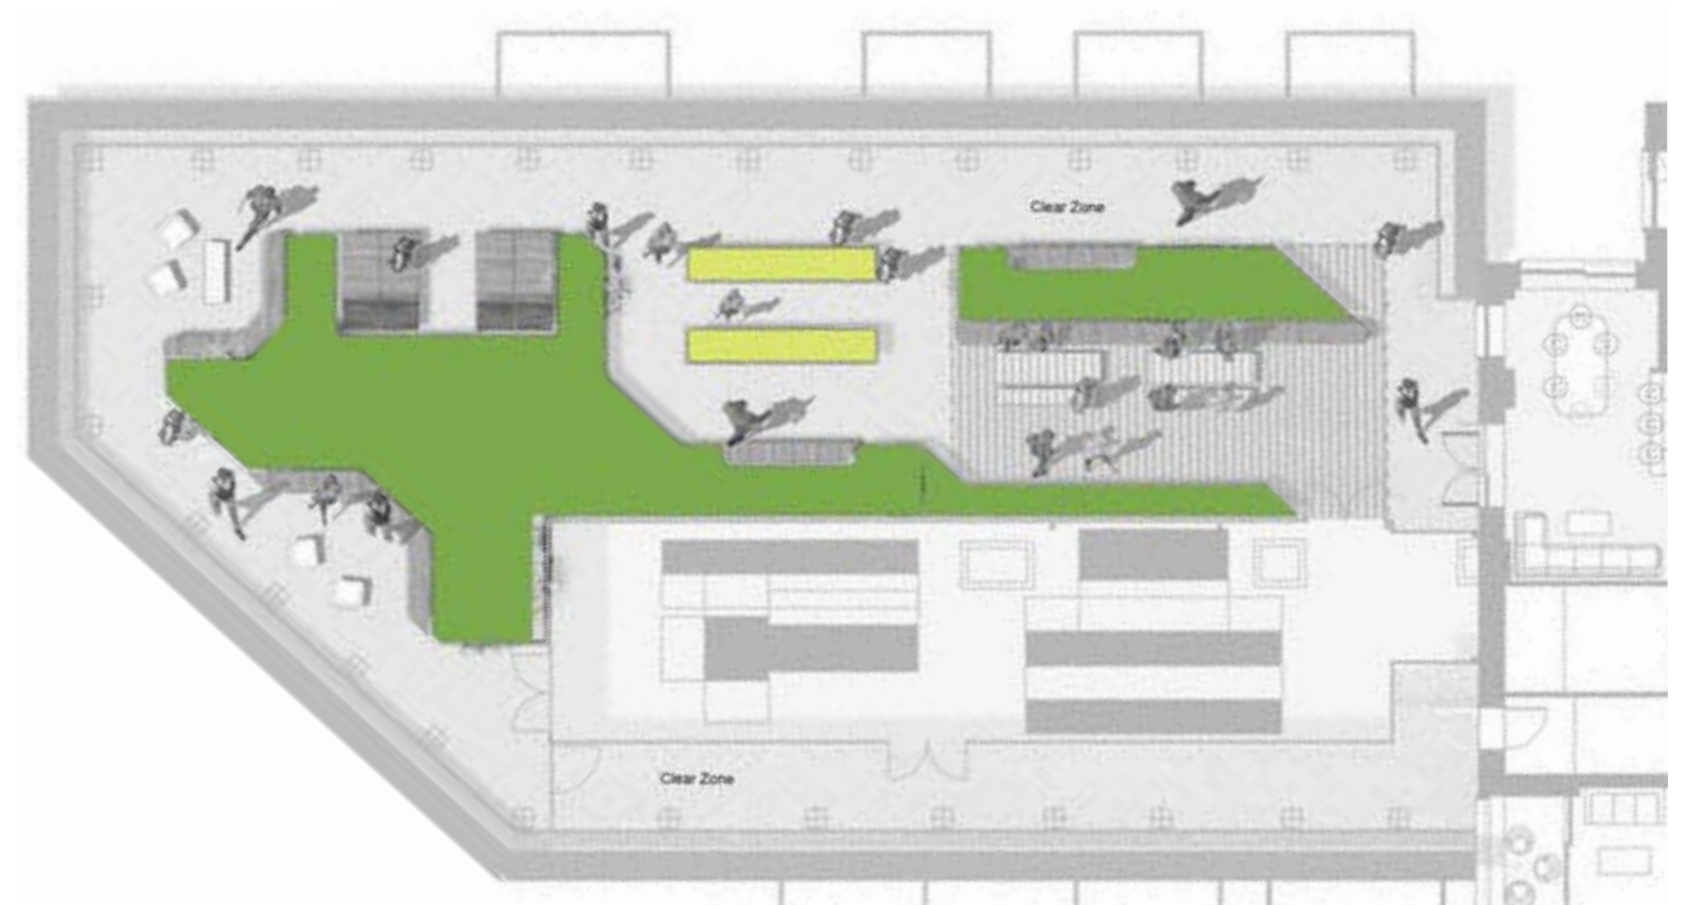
Diagram illustrating proposed planting strategy at N19 Roof Terrace
